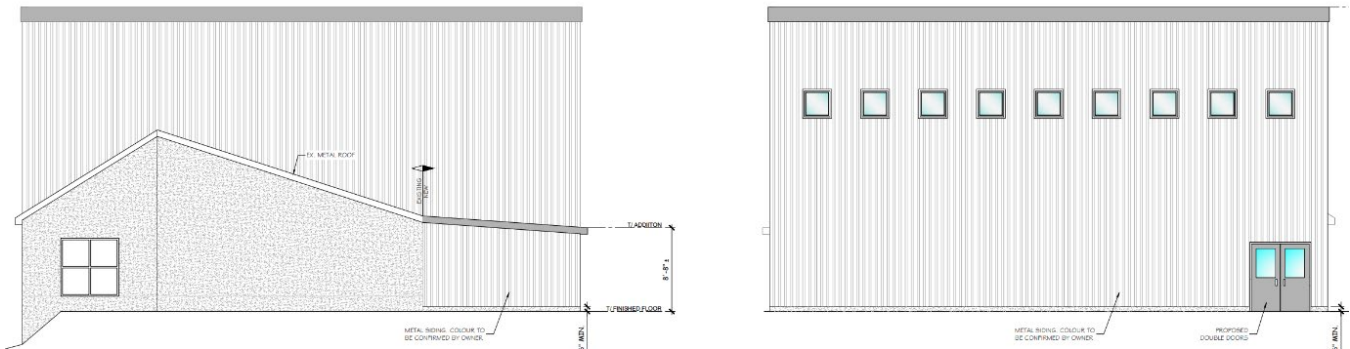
Northwest (left) and Southeast (right) Building Elevations (Source: Eastern Engineering)
